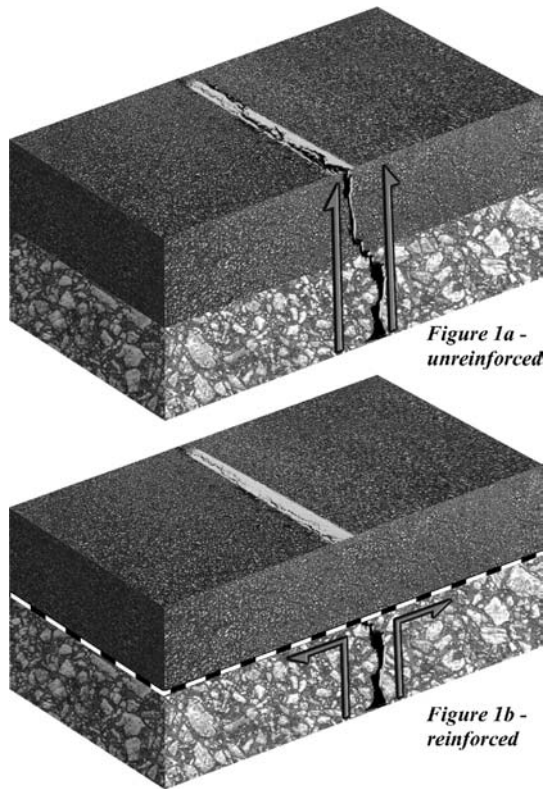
Direction of crack propagation in asphalt pavements.
